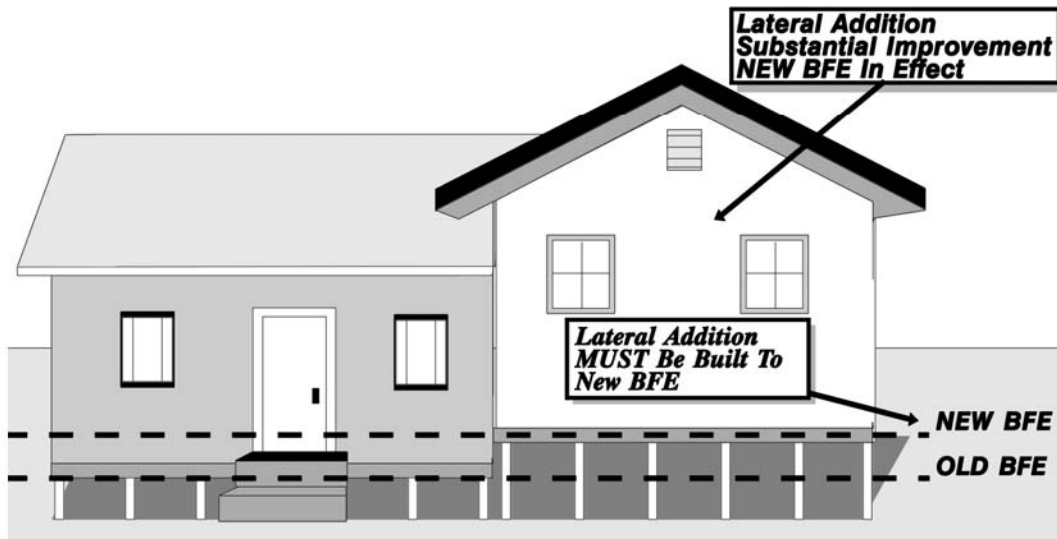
Substantial improvements to post-FIRM buildings must be elevated above the new BFE. Nonresidential buildings may be floodproofed
